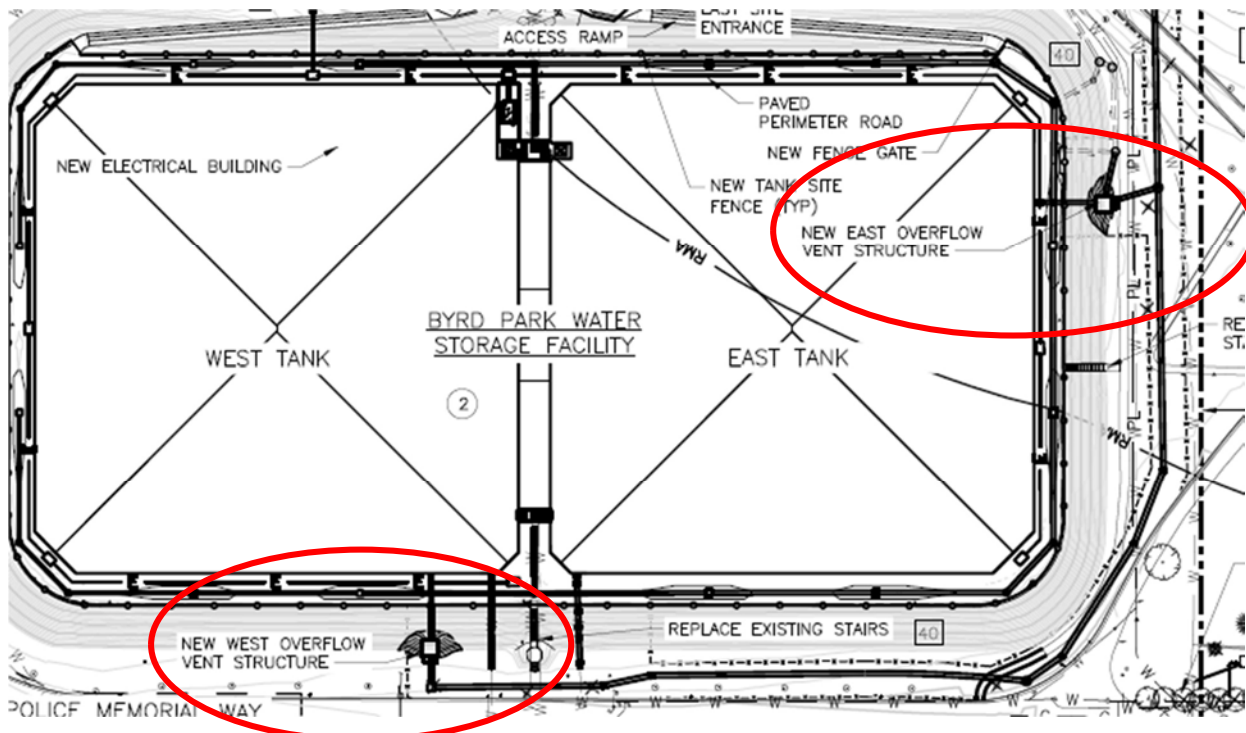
Byrd Park Reservoir roof replacement plans showing overflow
